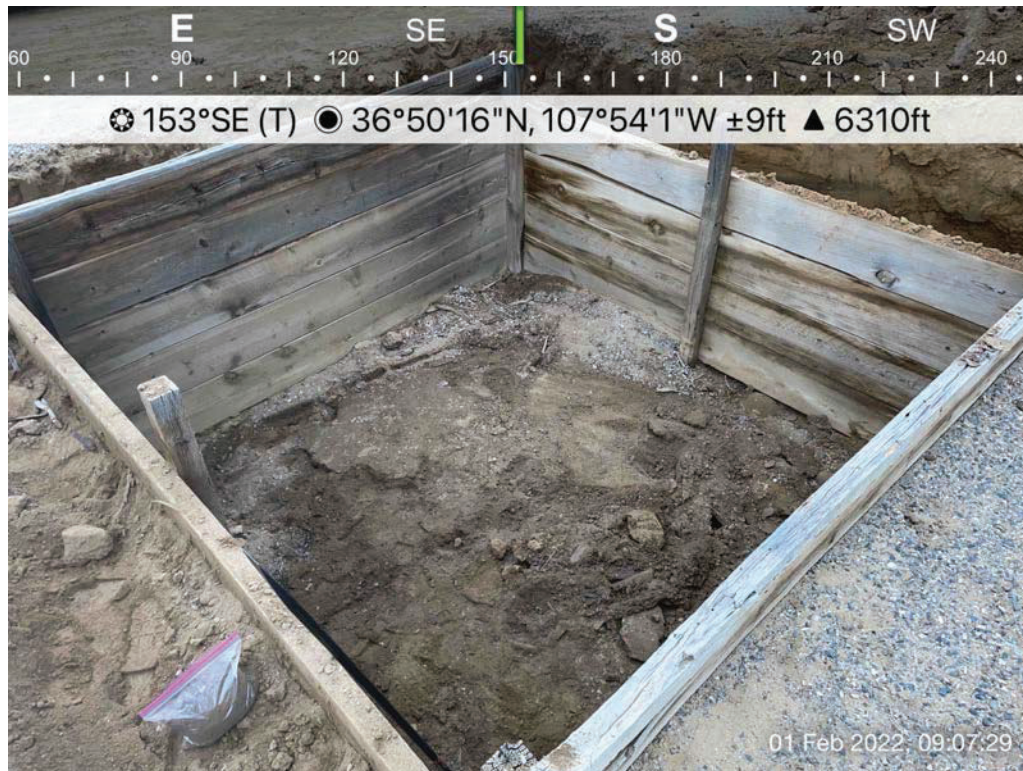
Former location of 45 bbls steel tank "A" following removal, 2/1/2022.
